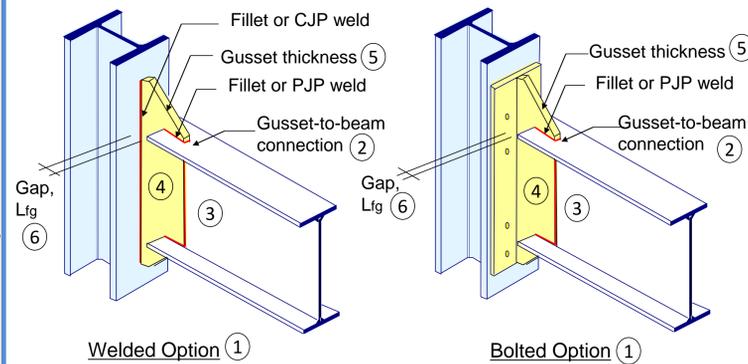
Illustration of the Proposed Innovative Gusset Plate Moment Connection
